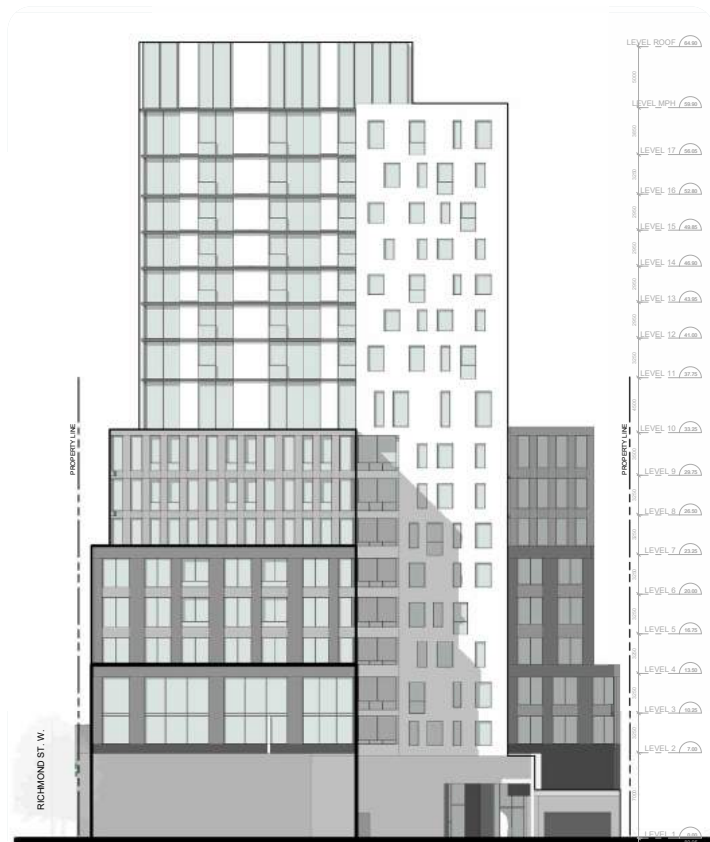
West Elevation (Prepared by Kirkor Architects)
